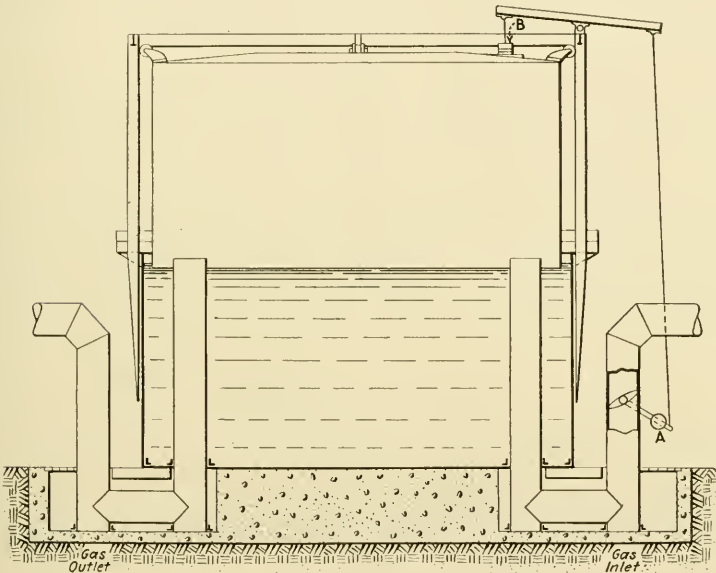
ARRANGEMENT OF REGULATING VALVE FOR GAS HOLDER
